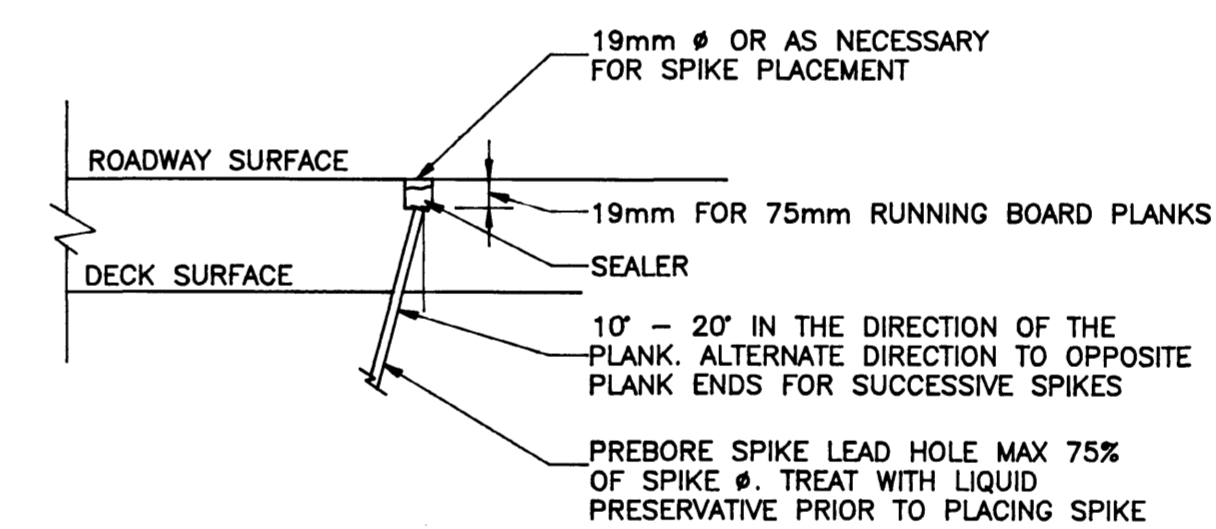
DETAIL - TRANSVERSE LUMBER CONNECTION TO BEAM
